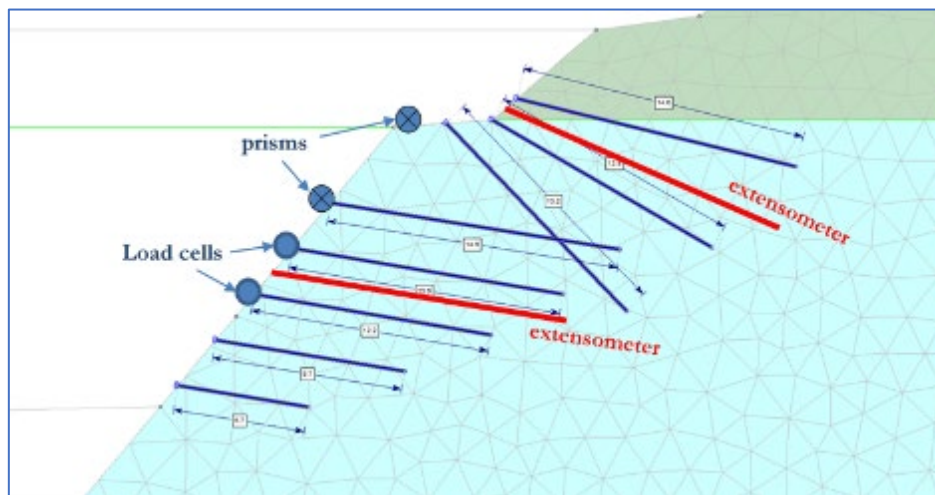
Cross section of design monitoring layout for extensometers, load cells and prisms.
